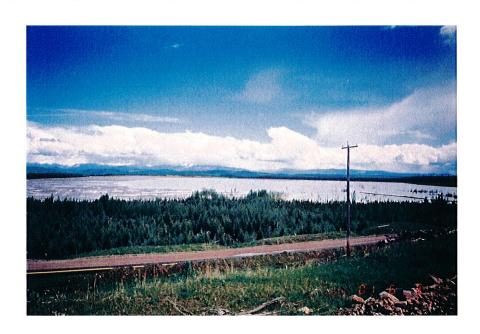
Reclaim Line and Tailings Impoundment – Looking East
